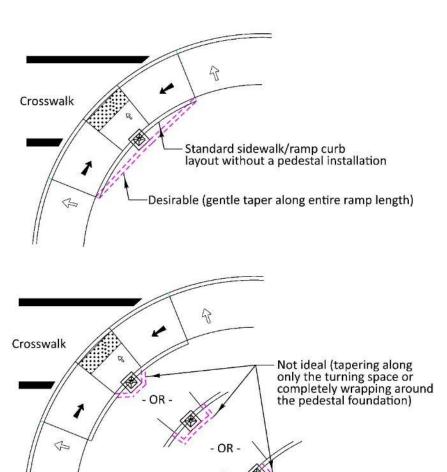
| Pedestal with Curb Around Foundation – Examples of Desirable and Not Ideal Curb Layouts
